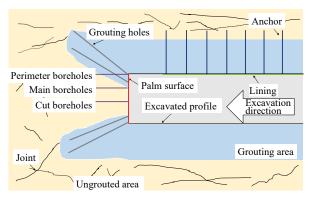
Diagram of "pre-consolidation grouting and post-blasting excavation" construction operation for underground tunnel
